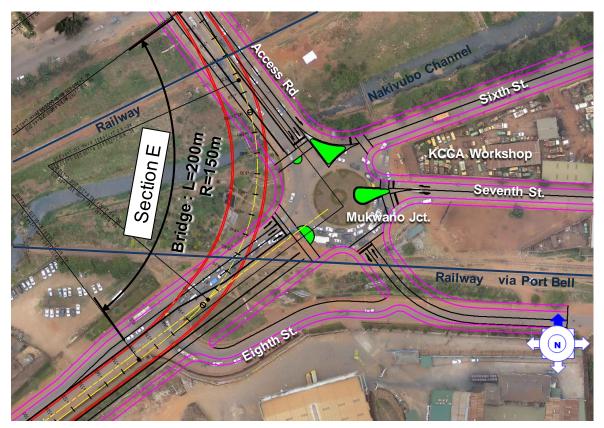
Section E: Curved section at Mukwano Junction Source: JICA Progress Report 2
